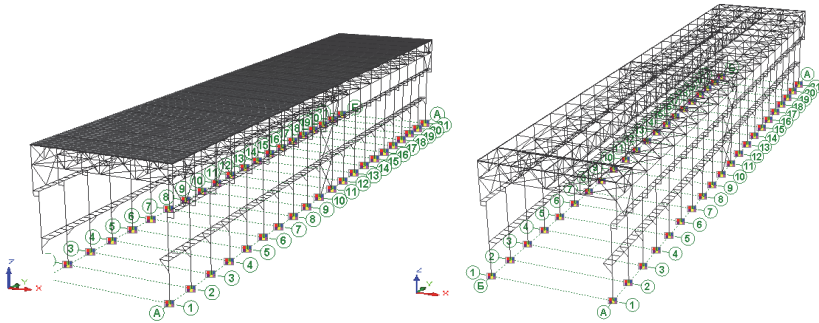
Spatial design models of industrial building: a) with a «heavy» coverage (prefabricated concrete panels); b) «light» coverage (profiled steel on purlins).
